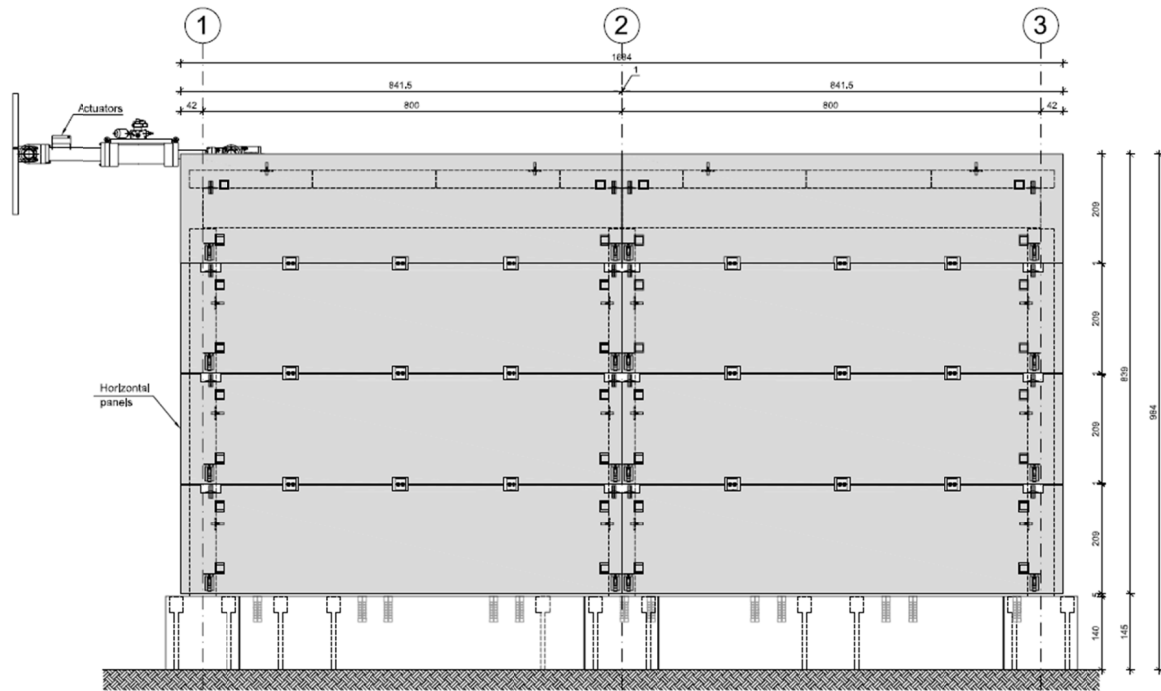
Prototype with horizontal panels: elevation longitudinal view
